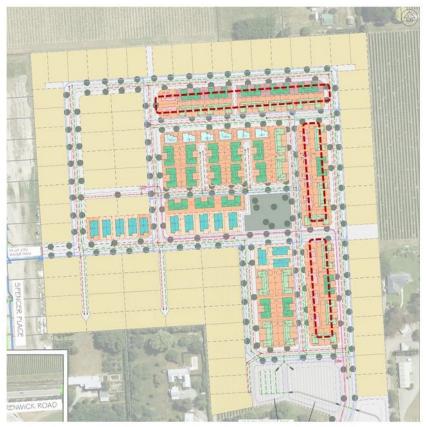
Urban Design Issue 2: the indicated blocks are too narrow for double-storey dwellings, resulting in backyard overlooking and overshadowing issues.
